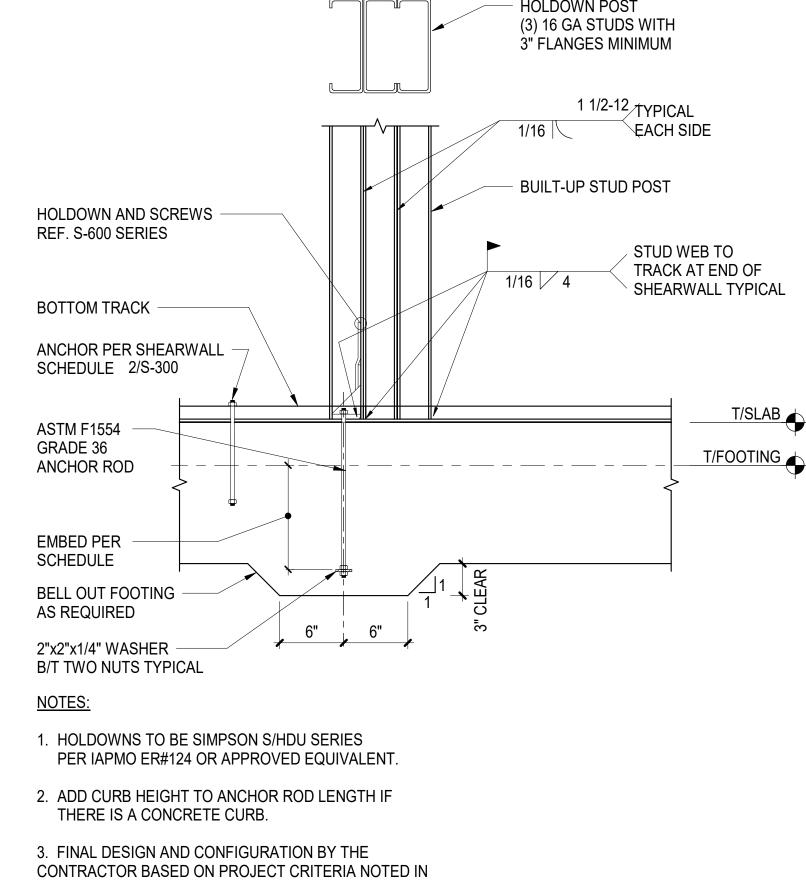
DETAIL FOR WALL BASE CONNECTION ONLY, REFER TO DETAILS 1, 2, 3 FOR FOUNDATION SECTIONS AND DETAILS
